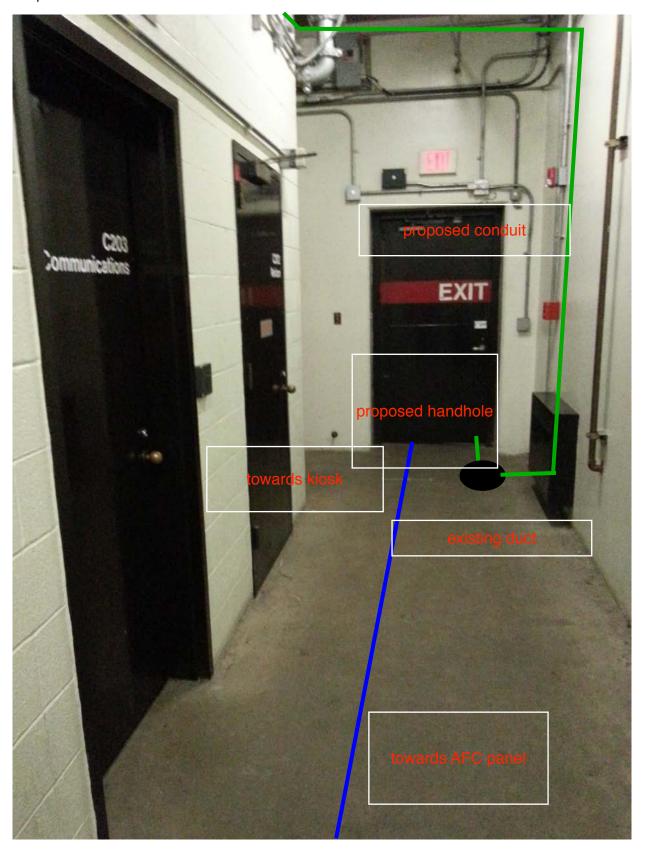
C13 King Street South: Existing duct and proposed conduit drop in floor to lower level towards AFC panel
